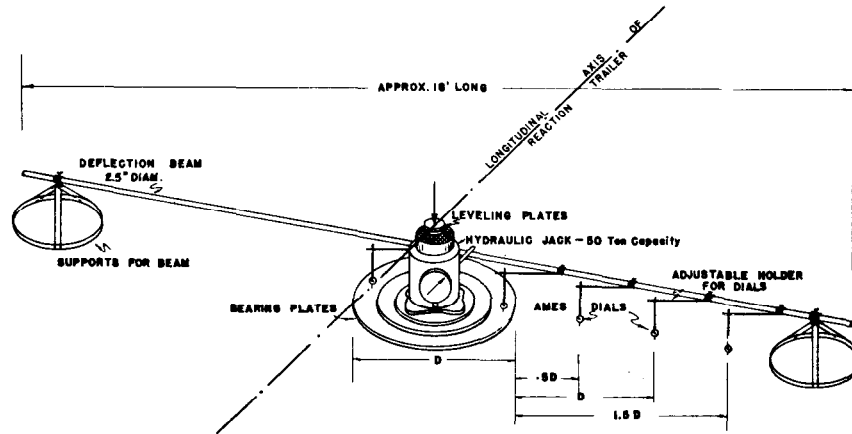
Diagram Showing Arrangement of Equipment for Bearing Test.
